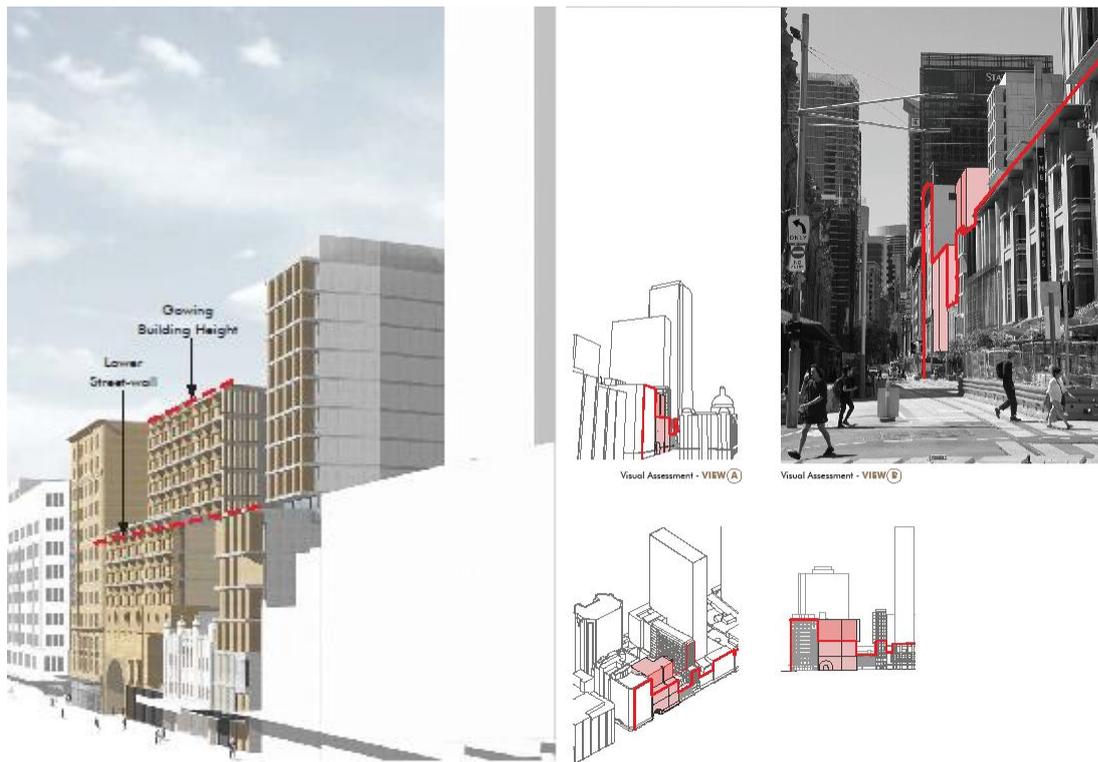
Extract from 'Facade Design Development Report (Candalepas Associates), showing an option matching the Gowings building height, setbacks and street wall height of buildings to the south
